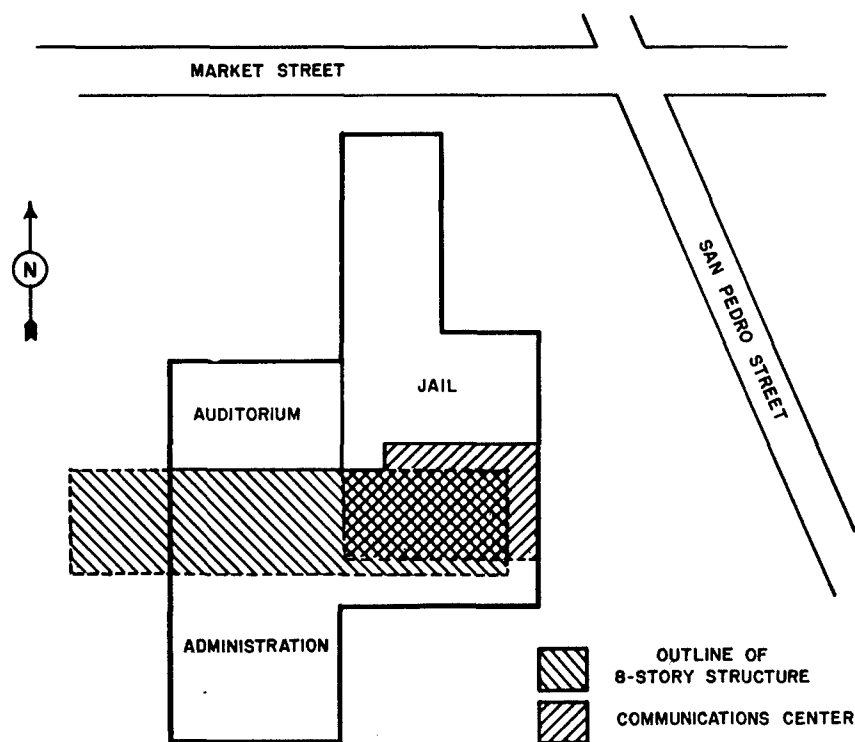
General floor plan of Los Angeles Police Department building.
